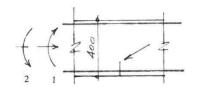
The ceiling of a buried underground structure section, 400 mm thick, eccentrically loaded
